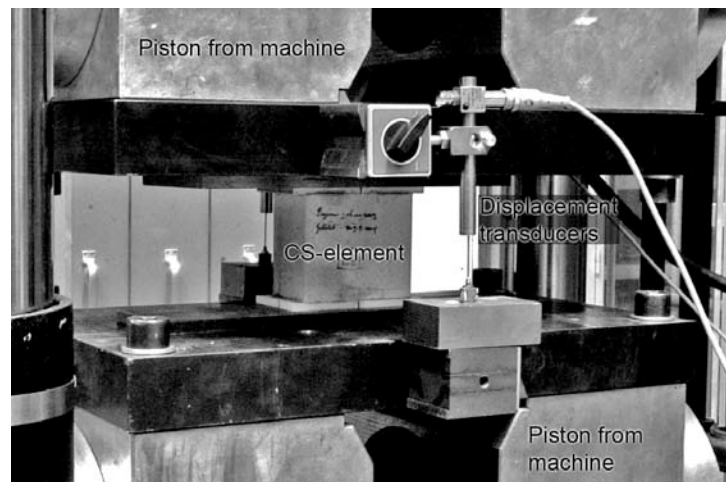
Capped CS-element inside the testing machine with applied displacement transducers
